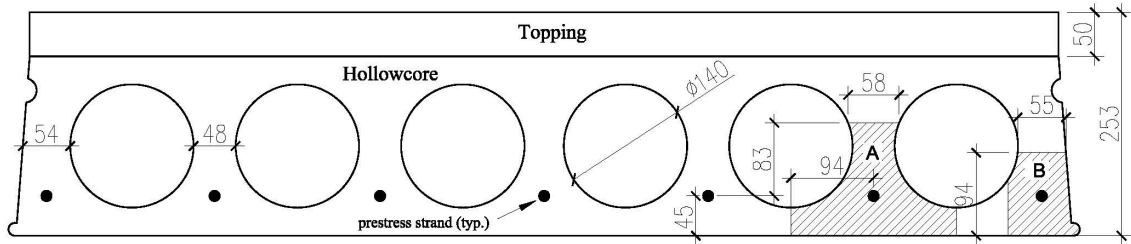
Flexural concrete tensile strength (typical slab)
